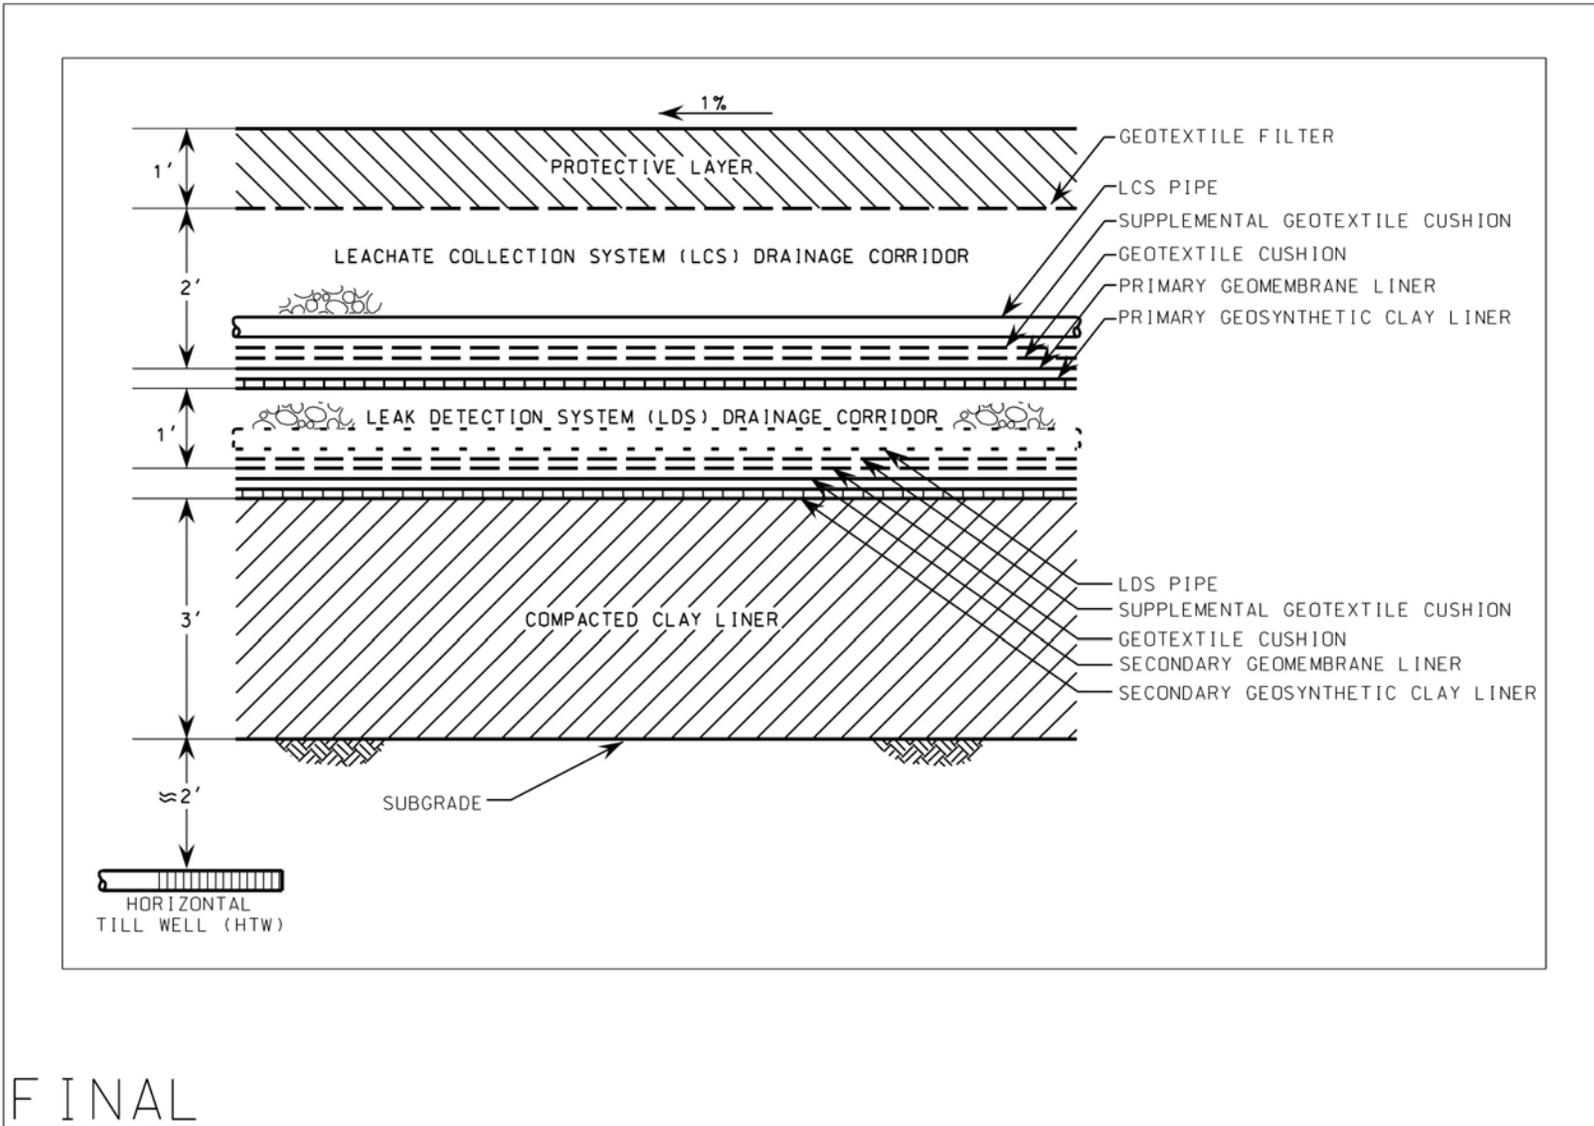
On-Site Disposal Facility Liner System with HTW at the Drainage Corridor
